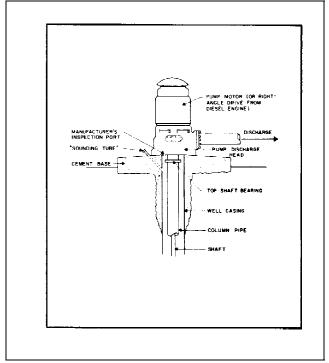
Sounding tube and manufacturer's inspection port locations on a turbine pump in a deep well.
